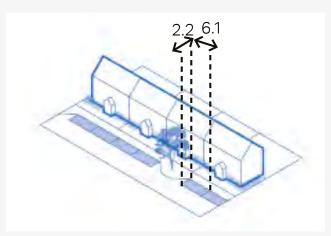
Illustrative diagram showing an indicative layout and recommended dimensions of on-street parking spaces.
